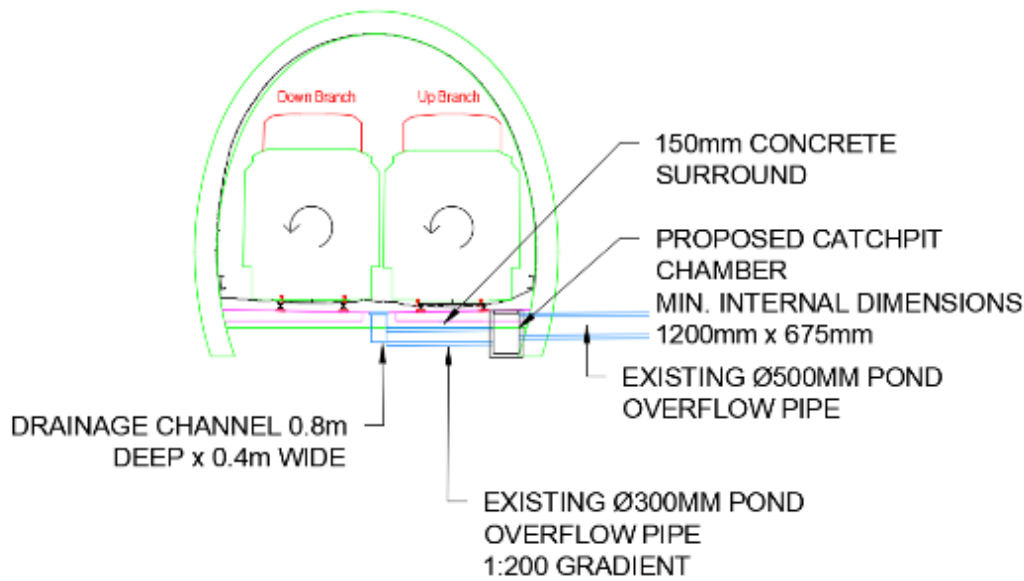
Proposed Drainage System at Tunnel for Pond Overflow
